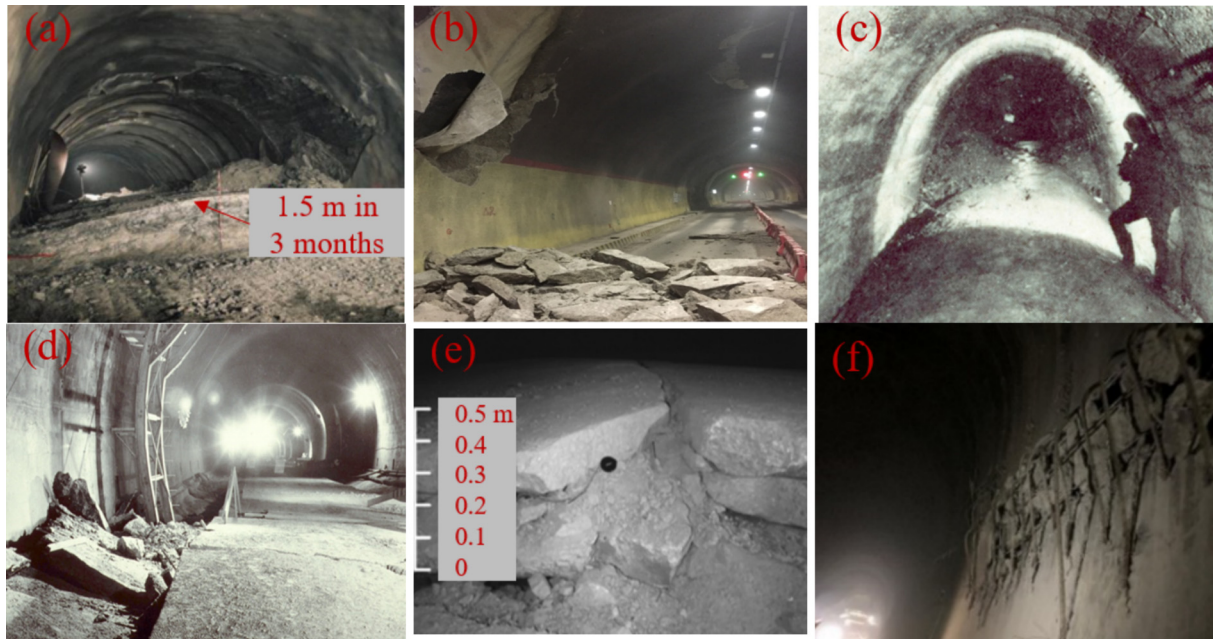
Serious diseases of tunnel due to sulfate rock. (a) Invert heave in Chienberg tunnel, (b) lining structure failure of the Dugongling tunnel, (c) heave of invert in Wagenburg tunnel, (d) heave of floor in the Belchen tunnel, (e) heave and failure of the tunnel flat-slab in Lilla tunnel, and (f) lining structure failure of the South Lvliang tunnel.
